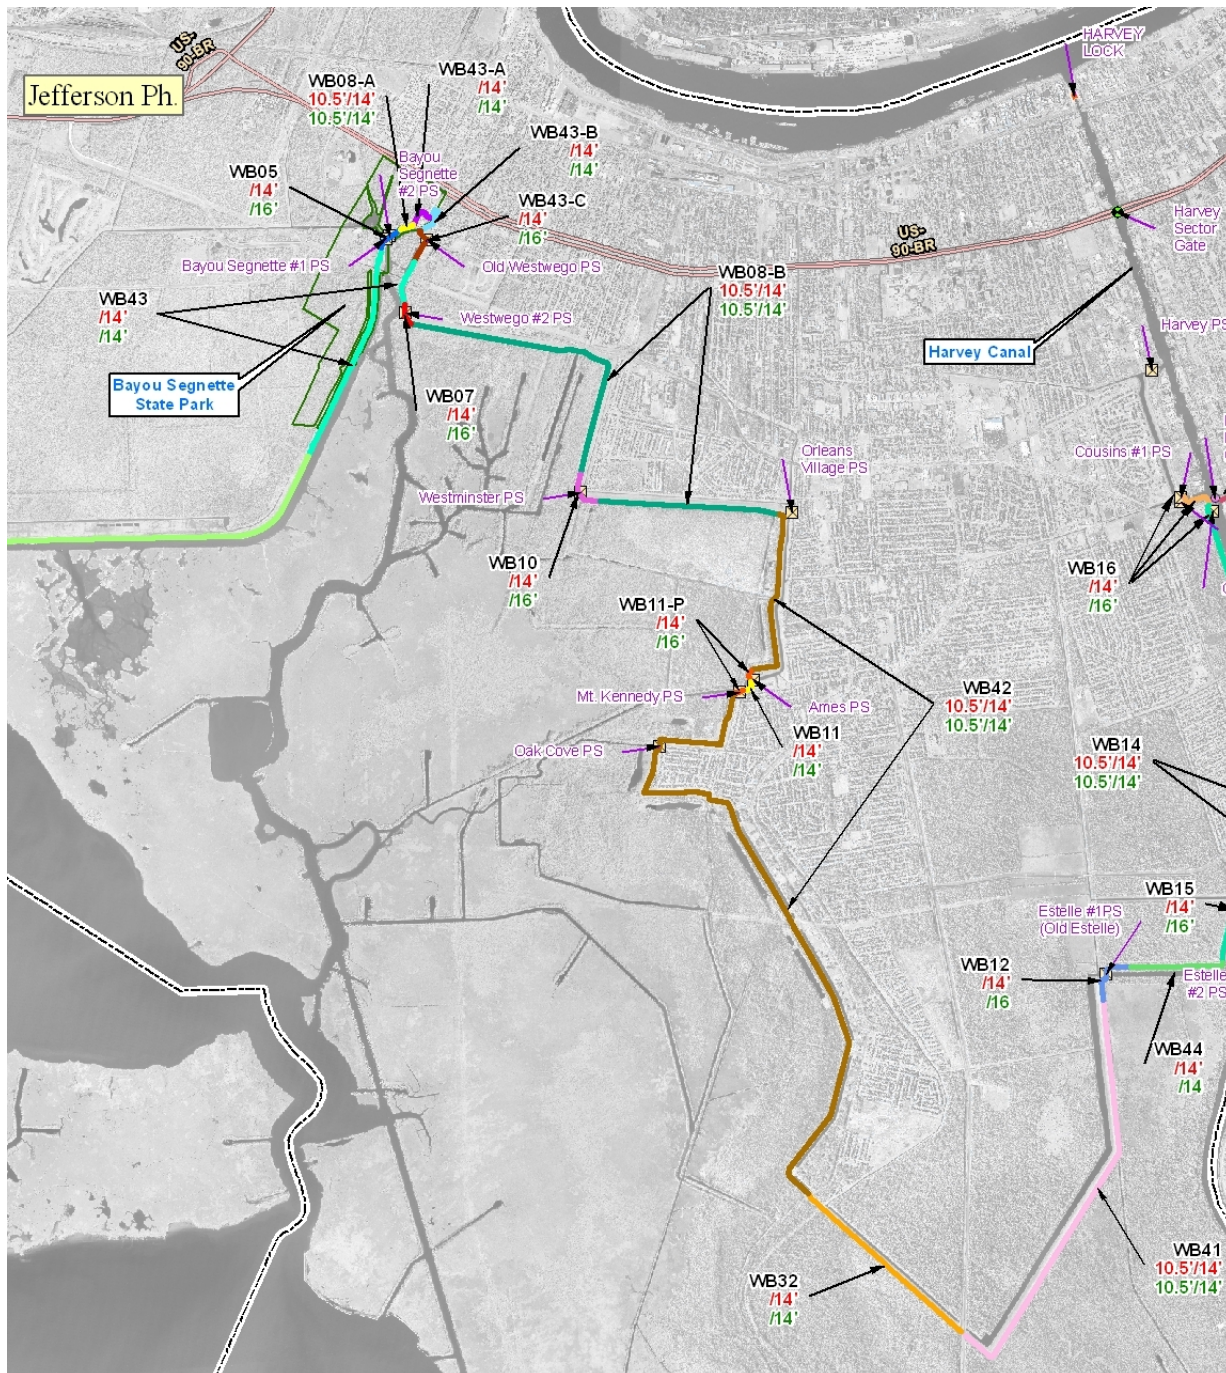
Levees, Floodwalls and Pump Stations in the West Bank (Westwego to Harvey Canal Reach)
